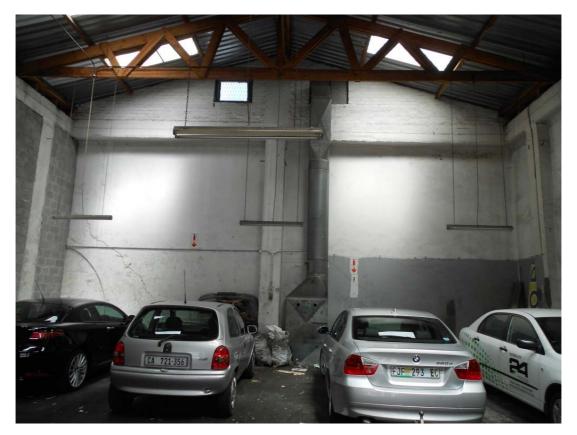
Internal view of Danny's Auto, showing wall shared with Atlas Trading.
